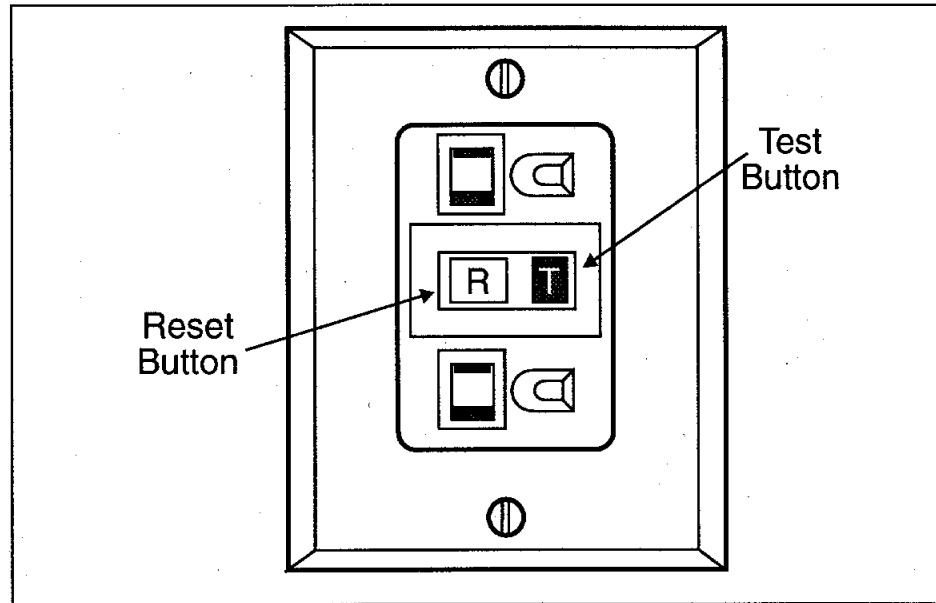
Receptacle-type ground-fault circuit interrupter (GFCI) (adapted from U.S. Department of Labor, 1981).
